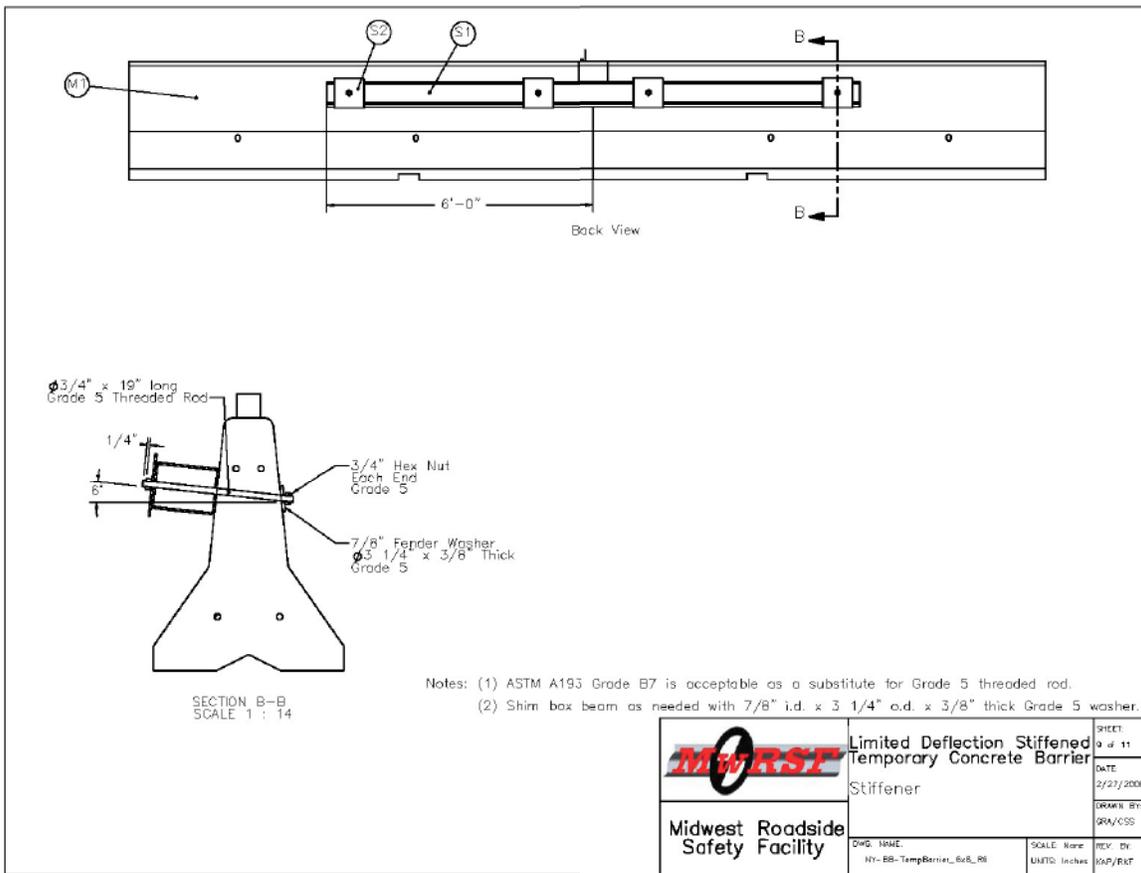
Box Beam Stiffener Details (English), Test NYTCB-3
